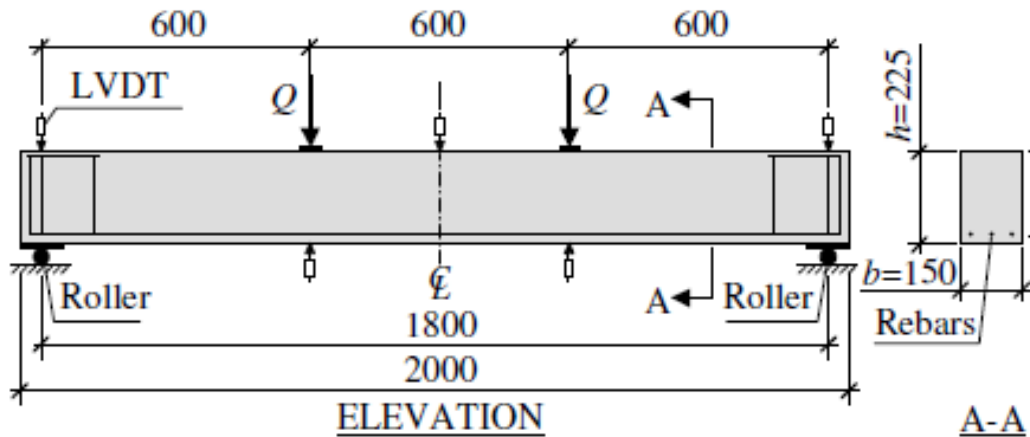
Dimensions and loading conditions for the beam tests, from Jansson (2008)
